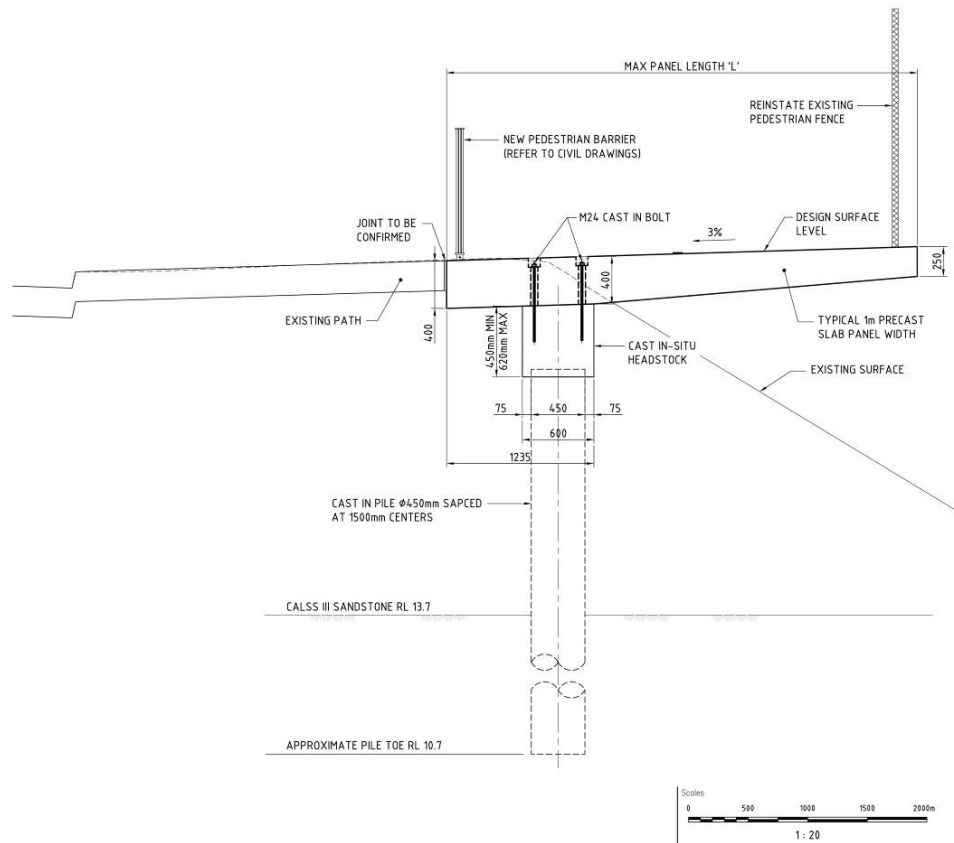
Section of the cantilevered walkway showing construction details. (Bridge to Bay Alliance - Victoria Road Upgrade, file name: HYD-DRG-BS-whitebay_2.dwg)
